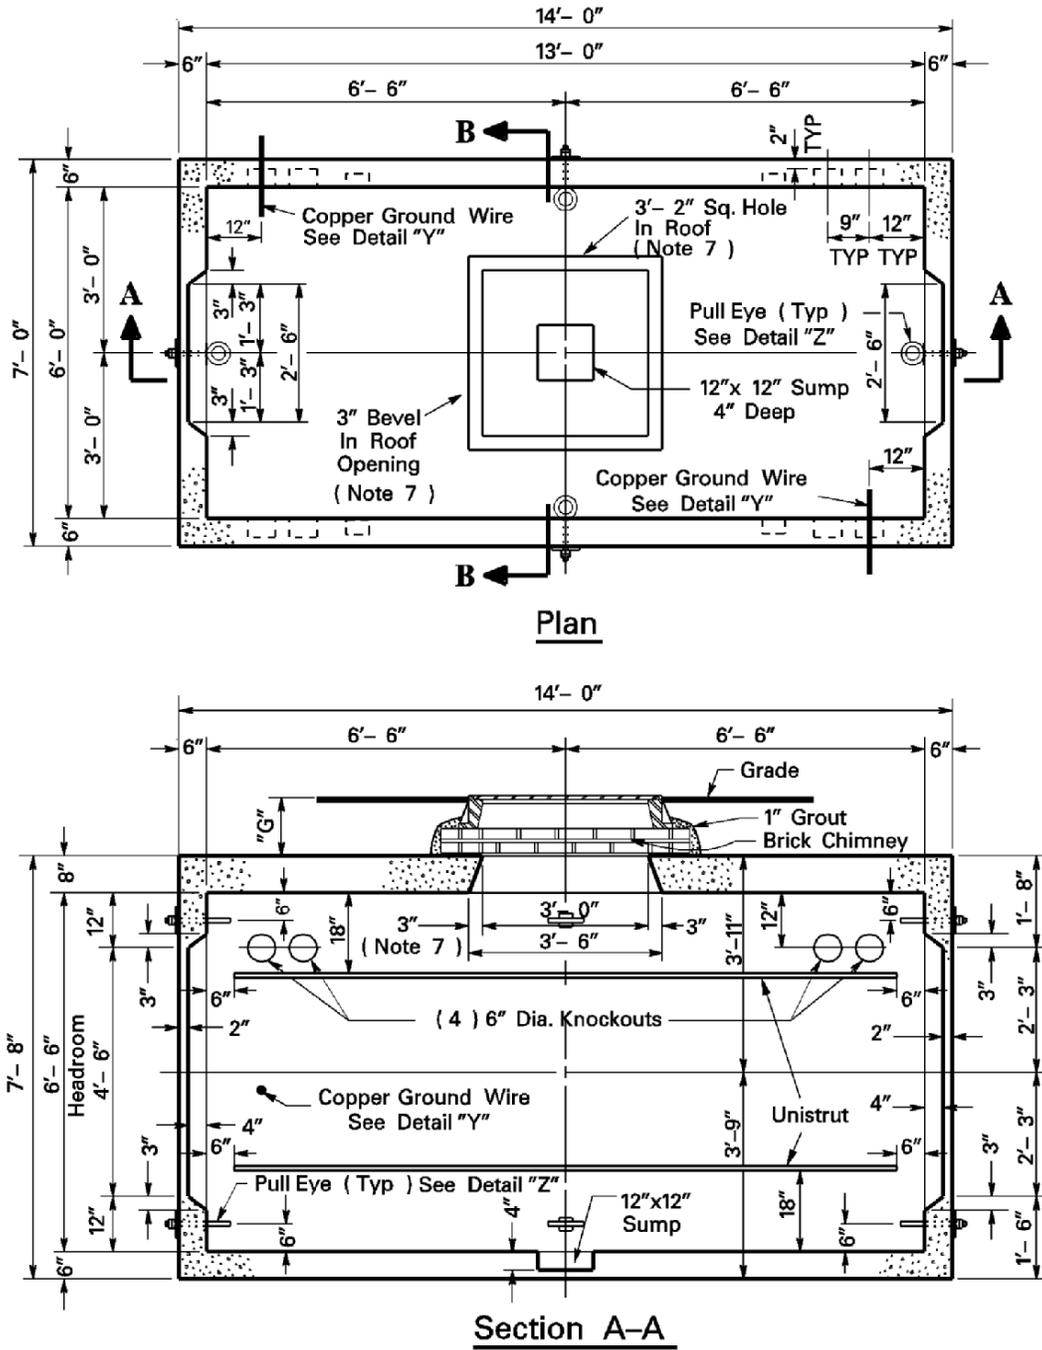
TYPICAL MANHOLE REQUIREMENTS
